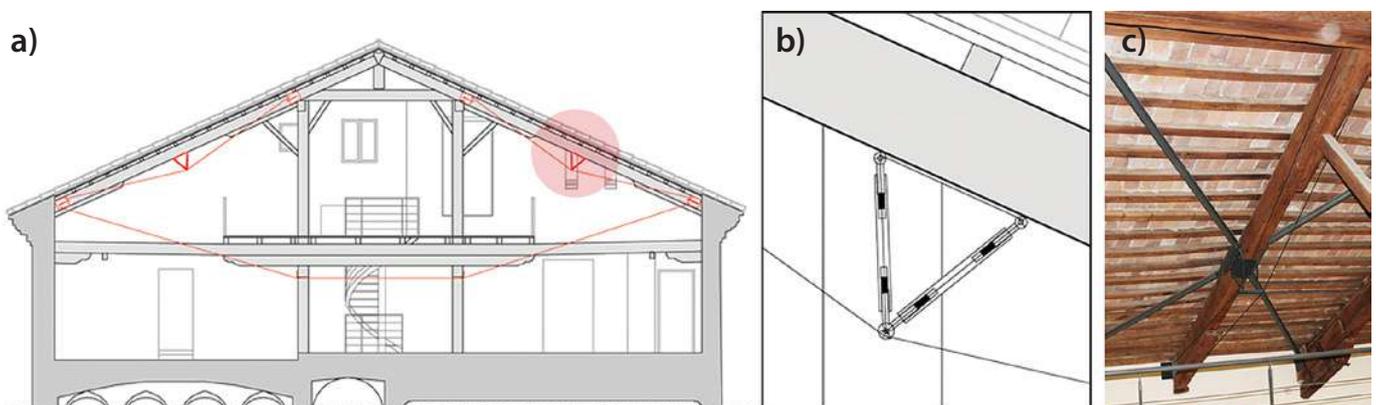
(a) A cross-section of the habitable attic room with the strengthening proposal for the roof structure. An intermediate support with post-tensioned metal wires has been added for class II and class III members; (b) a detail of the telescopic props; (c) a render of the reinforcement.
